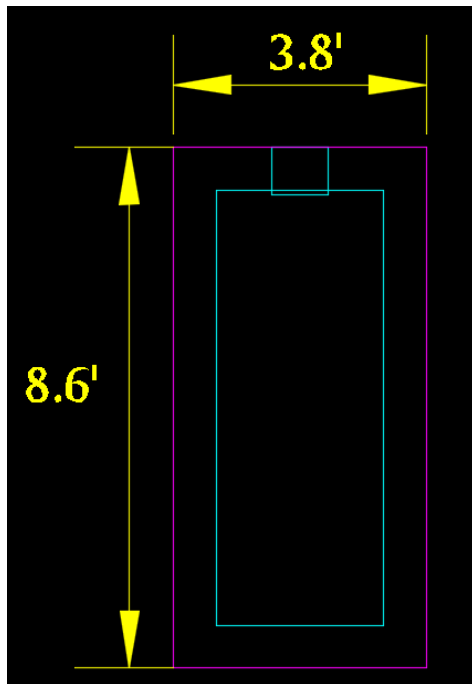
Plan View of Single Grave 24-Inch Wide Grave Sleeve
